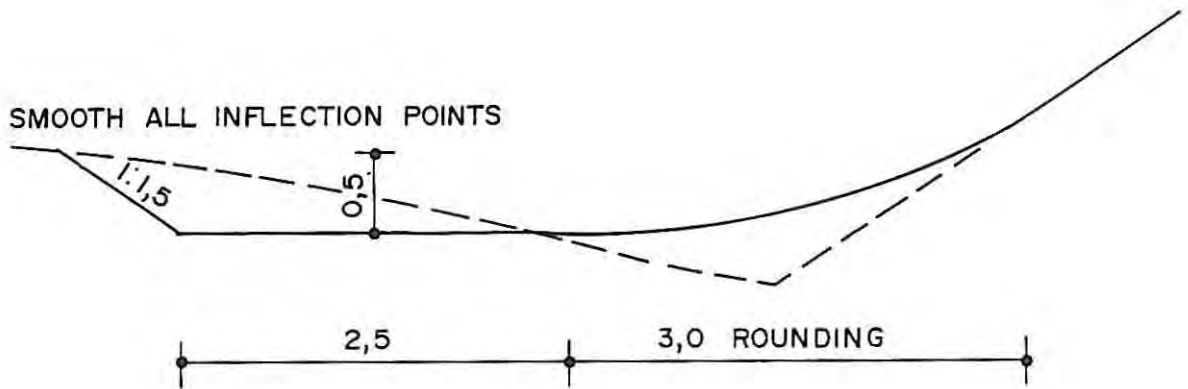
TYPICAL TOE DRAIN DIMENSIONS
